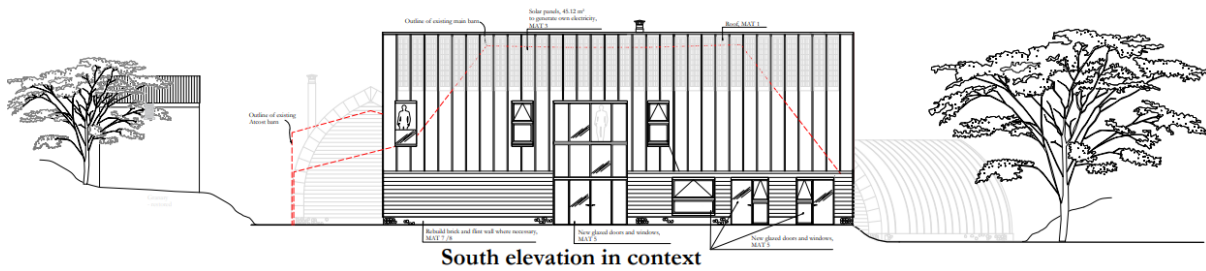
Proposed elevations of Barn and Annexe (not to scale)
